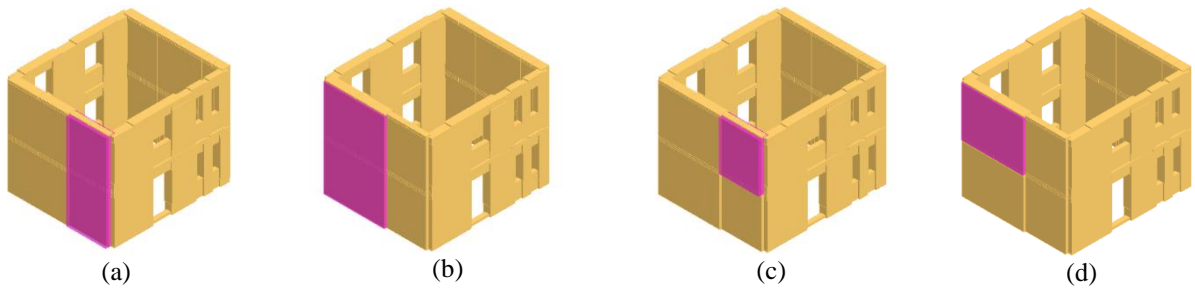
Local mechanisms considered in the linear kinematic analysis of the North-West façade: first and second floor of (a) hollow block and (b) irregular stone wall portion; second floor of (c) hollow block and (d) irregular stone wall portion.
